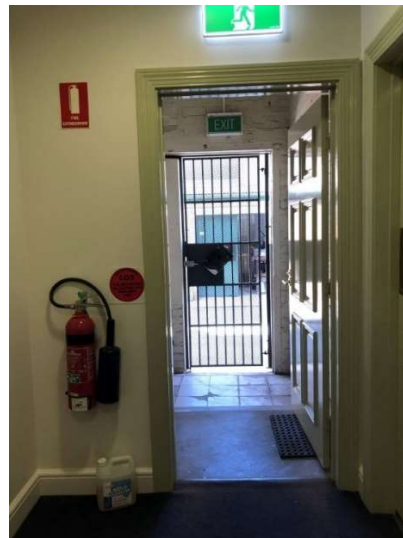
View from the rear hallway towards rear access to Quay Lane.
